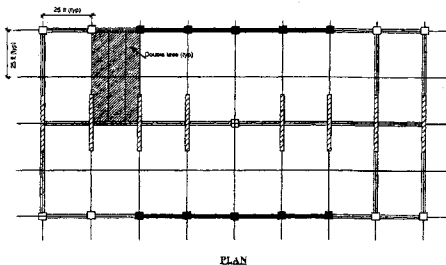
Prototype Building with Pretopped Double Tees (Hollowcore Building is similar)
